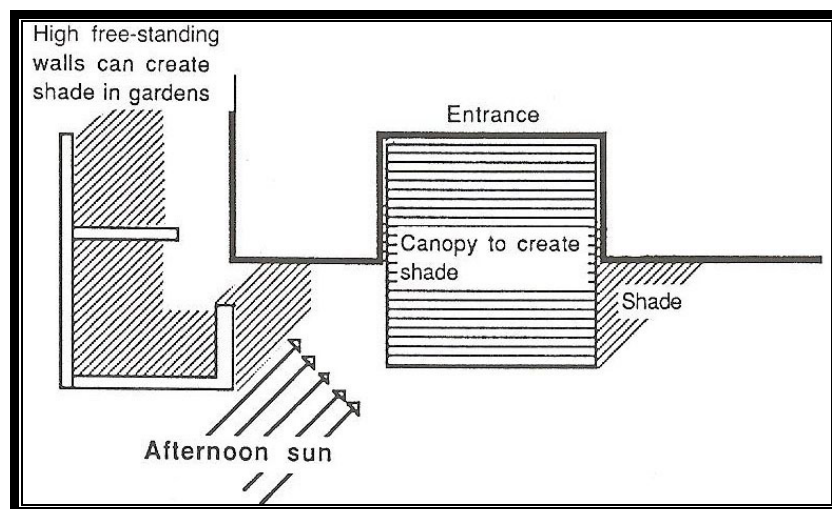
The Positioning of Walls and Buildings Can Create Cooler Areas by Casting Shade. (Beer, R, A. 1990. 80)
